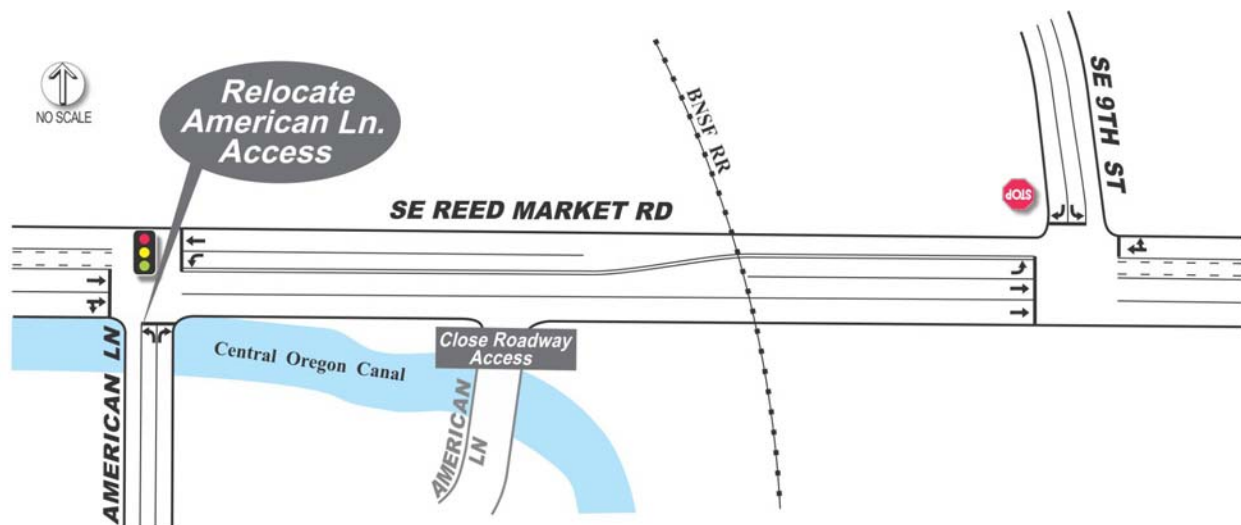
American Lane and SE 9th Street Interim Construction Phasing
